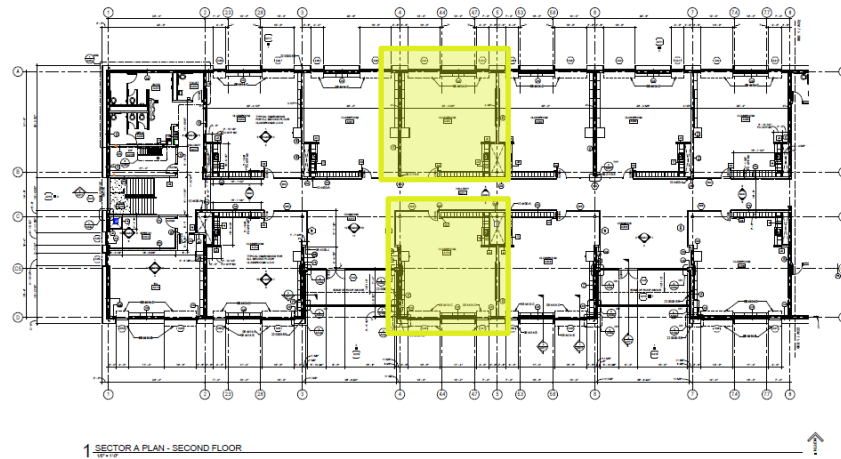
Second Floor- Selected Classroom 2 (South) and Classroom 4 (North). (Provided by Pivot Architects)
